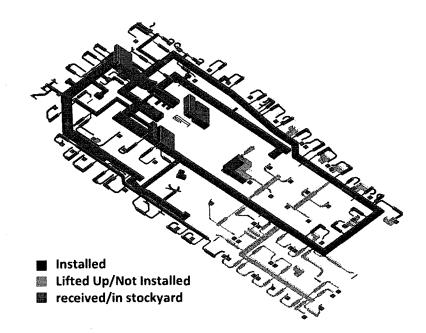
HVAC 3D Drawing of One Floor of the JMSB Building: Construction Phase
